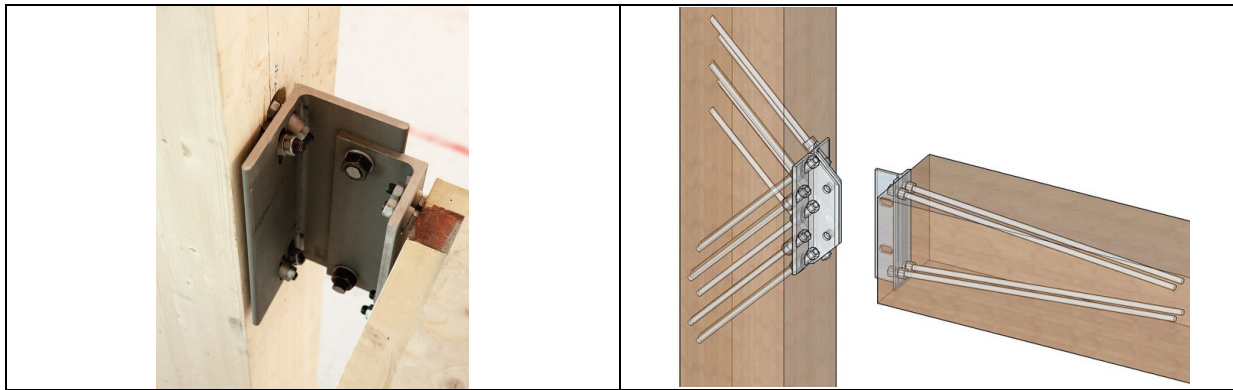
Picture of the connector installed between the floor element and the column (left) and principle of the connector showing the threaded rods (right).
